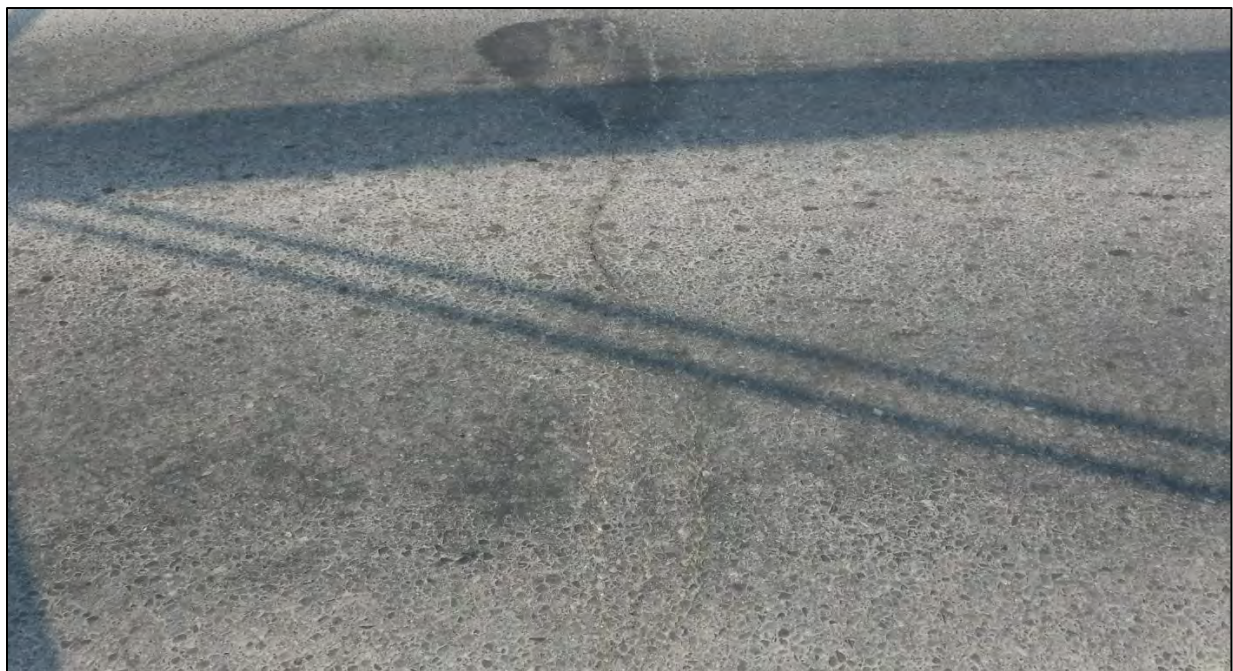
Typical 1/8 in. wide transverse crack located above each floor beam
